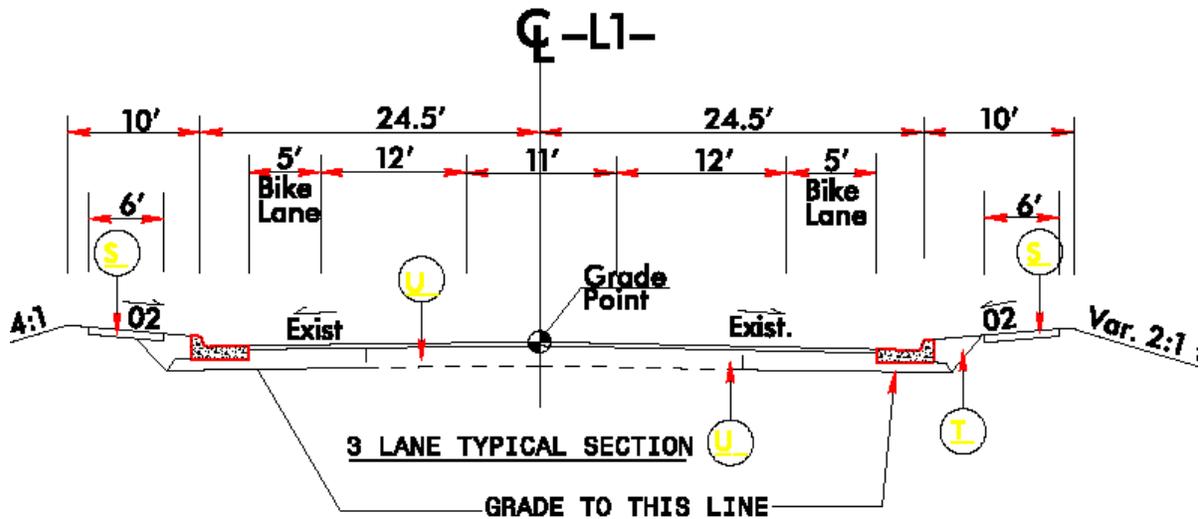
Three-lane Typical Section, 69 feet wide not including slopes
